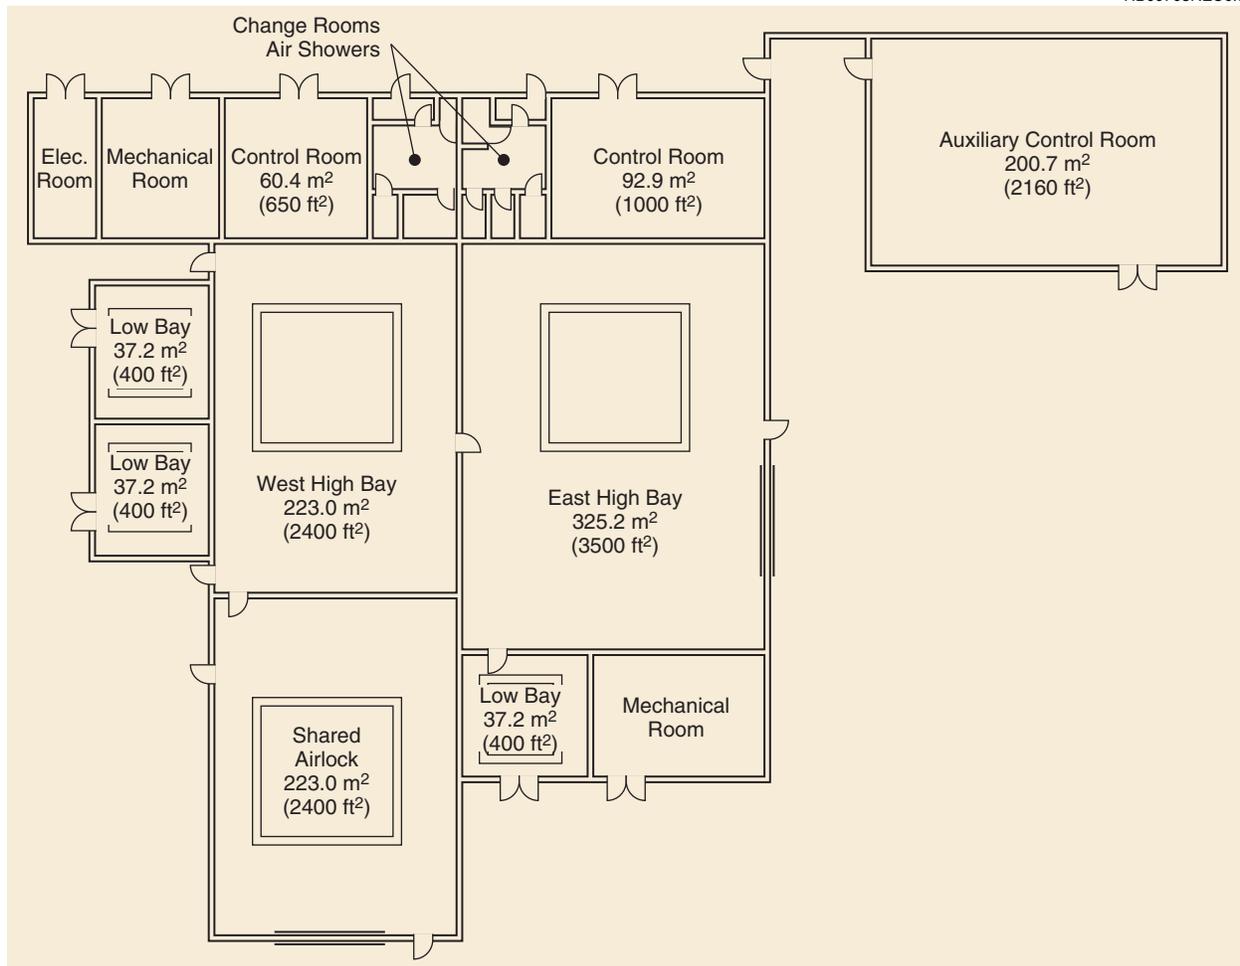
Astrotech Payload Processing Facility (Building 1032)
